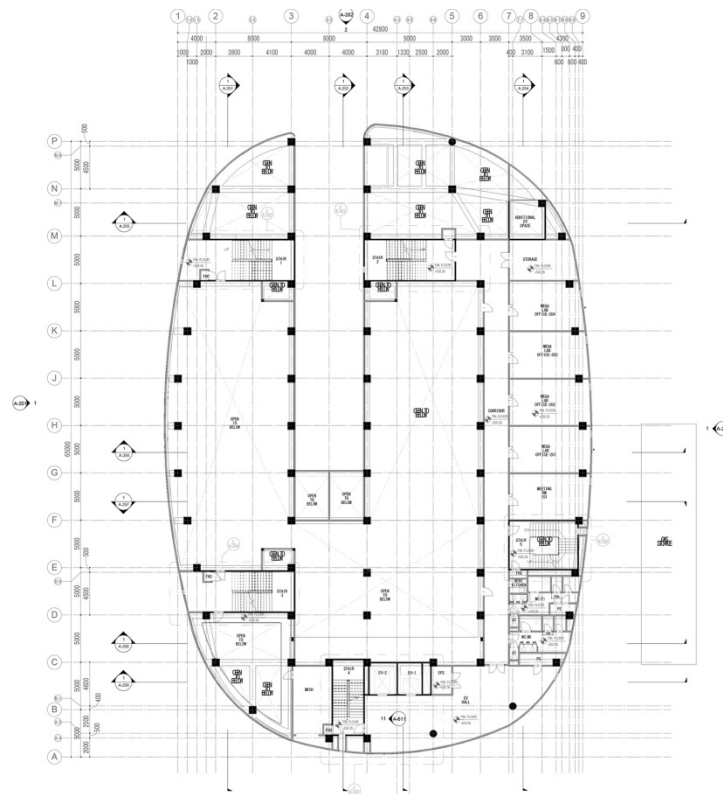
RCC 1<sup>st</sup> Floor Plan
